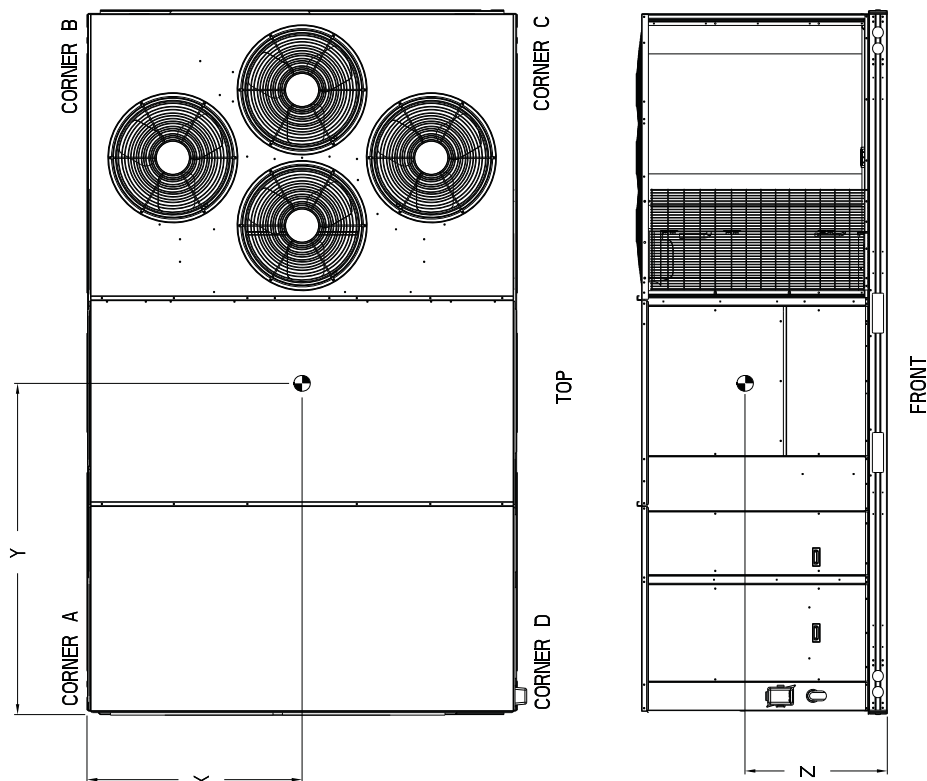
RHS240-243 Unit Dimensional Drawing (cont)
